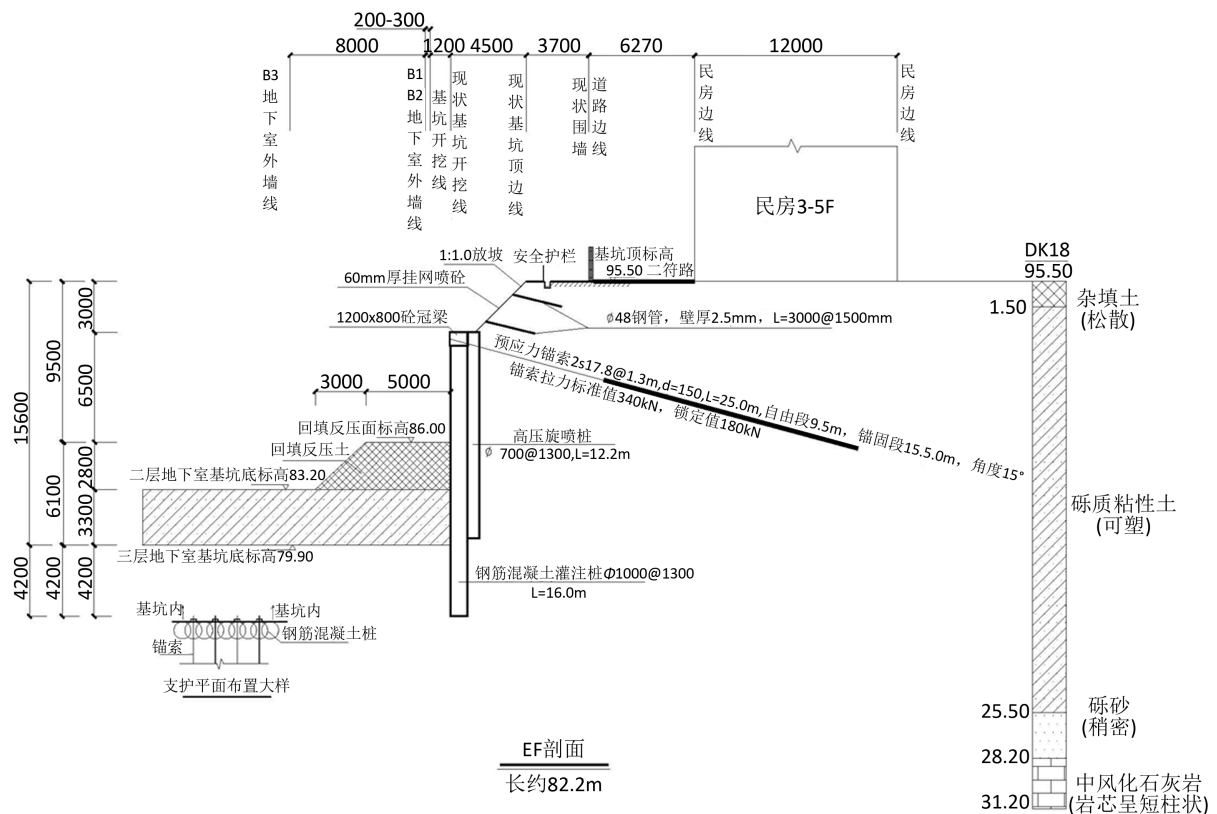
EF backfill section after the backfill section of the cross-section (backfill to 9.5 m)
